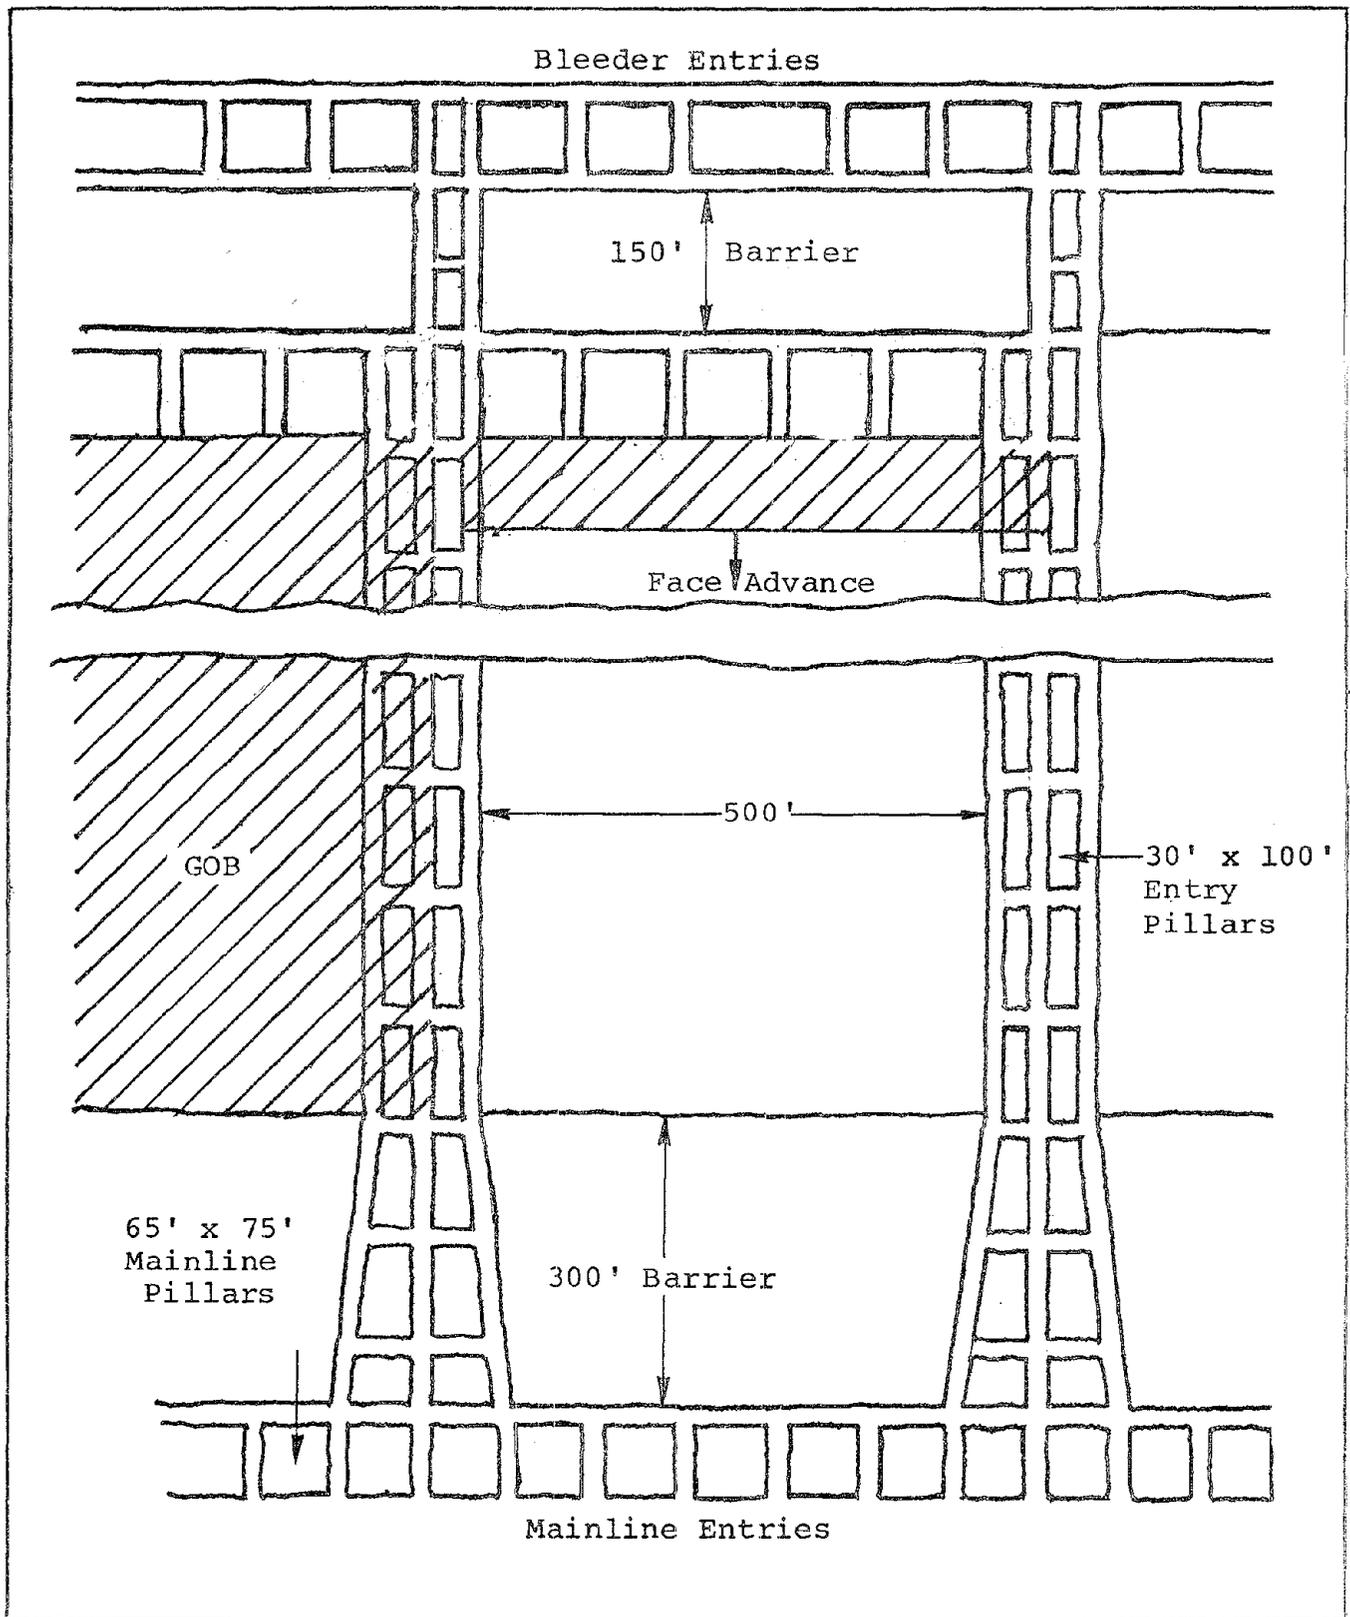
Longwall 3-Entry Development Plan for SUFCo Mine
